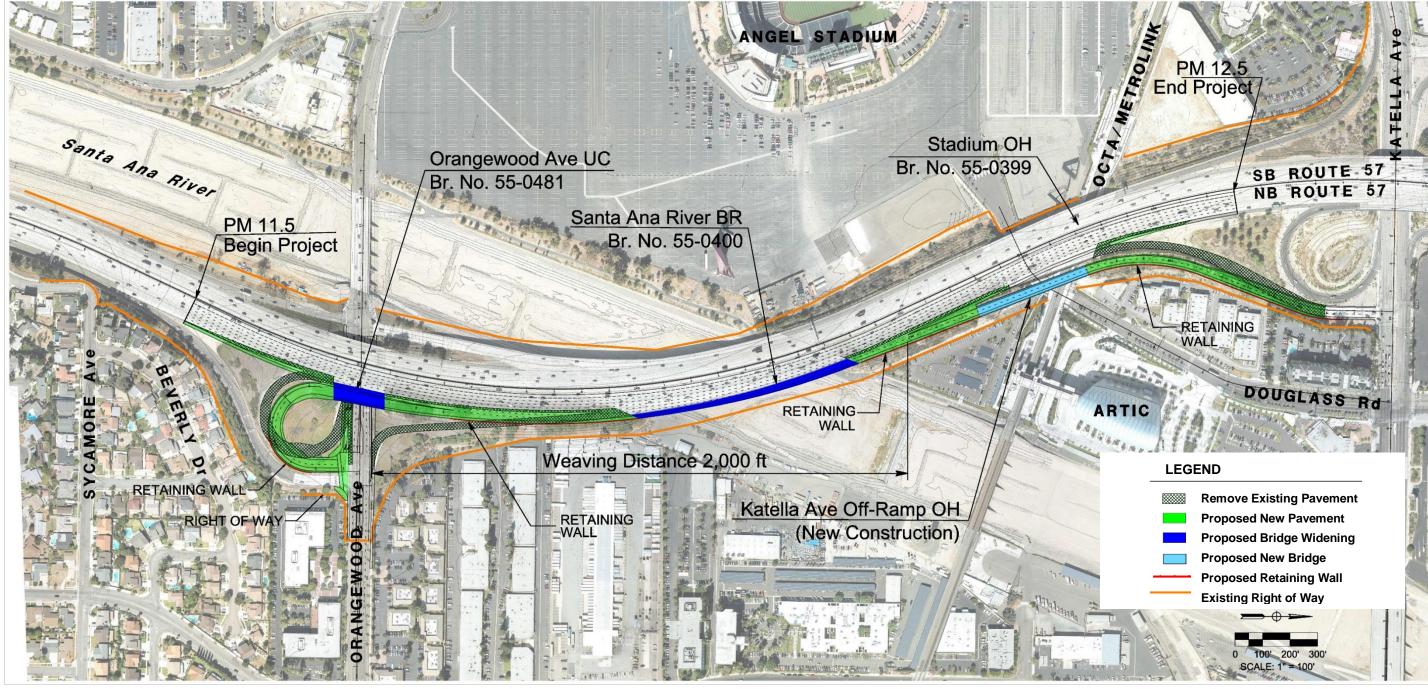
Alternative 2A - Eliminate Orangewood Avenue On-Ramp, Construct Katella Avenue Off-Ramp (Widen 2 Bridges, Construct New Stadium OH Bridge)
